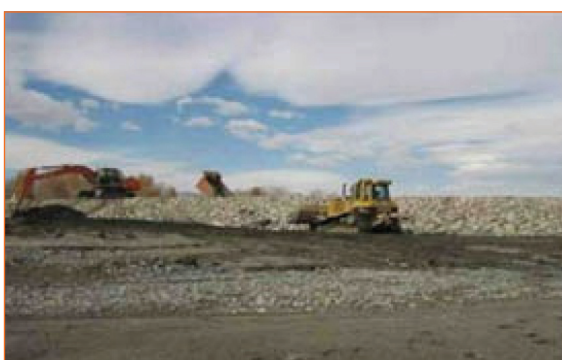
Earth dam with stone coat at upper barrier, mud core in the middle
